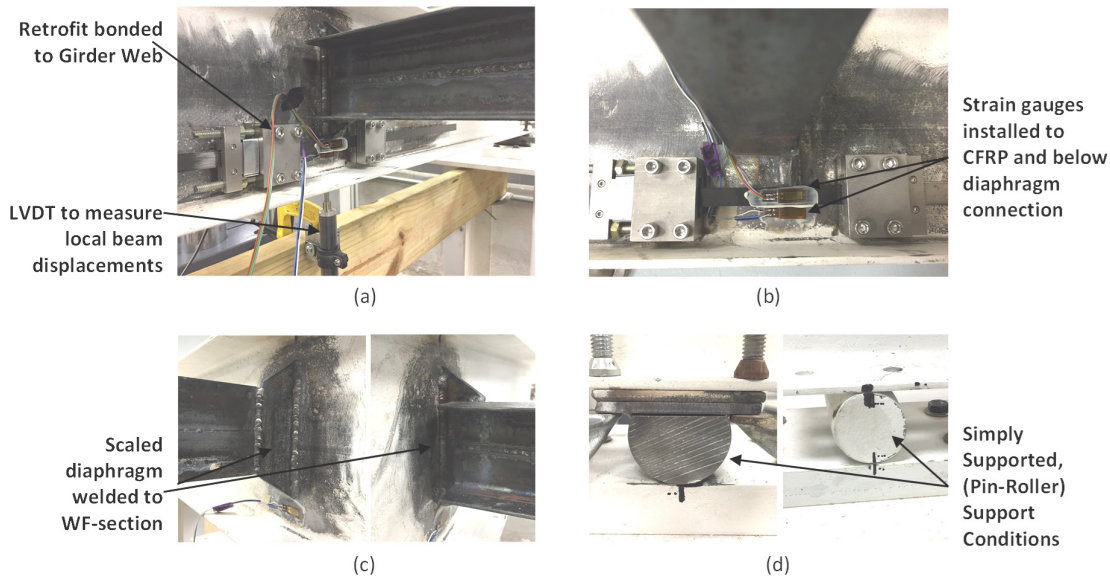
Pictures of experimental test setup showing (a) Retrofit bonded to structure, (b) installed strain gauges, (c) diaphragm to web connection detail, (d) test support conditions
